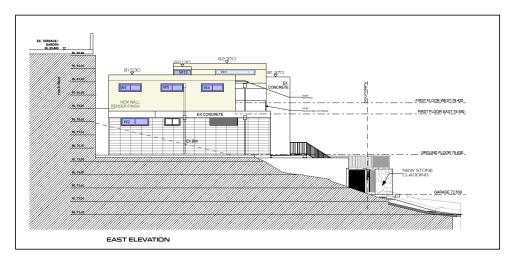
Proposed eastern elevation (CasaFabrica, 2024)
